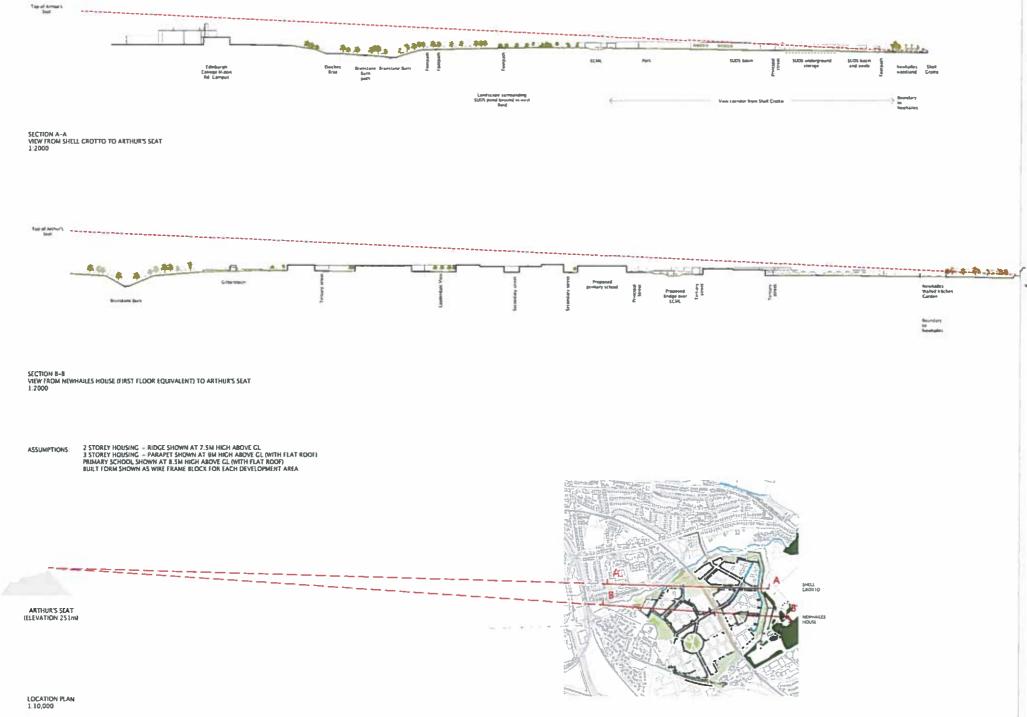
SECTION FROM NEWHAILES SHELL GROTTO (CATEGORY B LISTED BUILDING LB10915) AND NEWHAILES HOUSE (CATEGORY A LISTED BUILDING 10911) TOWARDS ARTHUR'S SEAT SCALE 1:5,000
